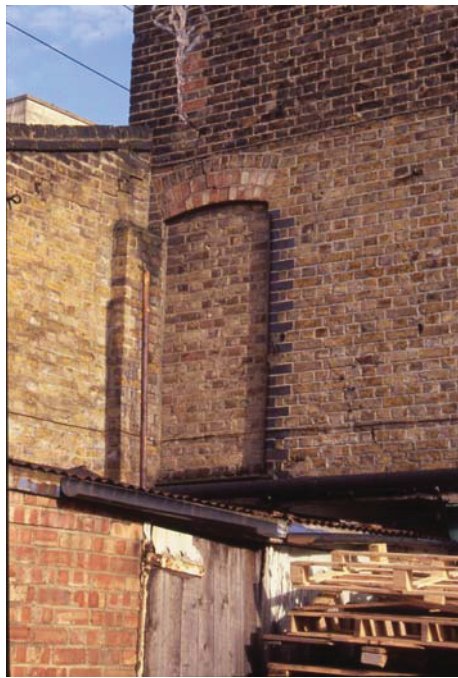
Detail of blocking in west elevation of Building 6, Engine House, looking north-east
